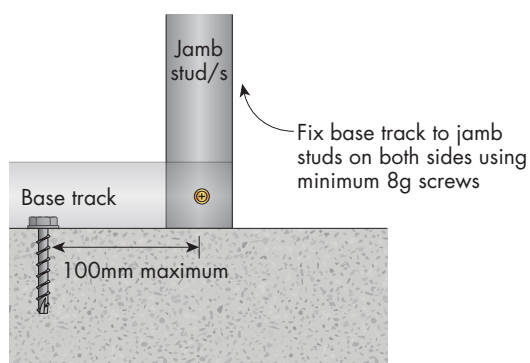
Base Track Connection BC2 - Doorway
